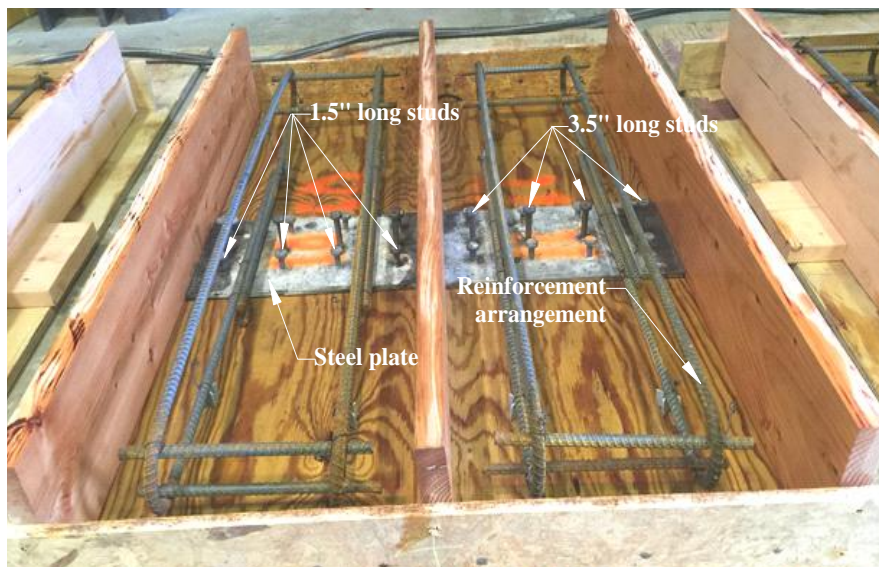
Positive bending flexural test formwork for substrate concrete placement
